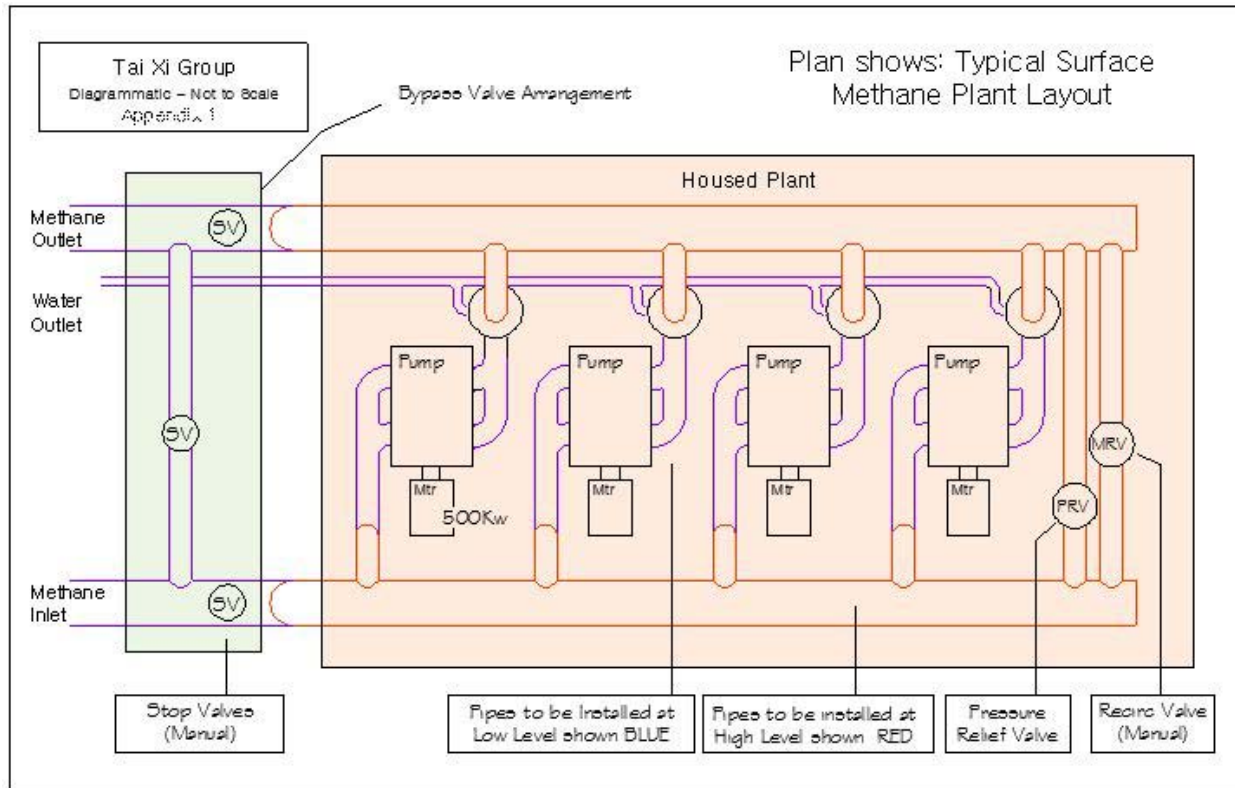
Schematic Drawing of Typical Methane Plant Layout
